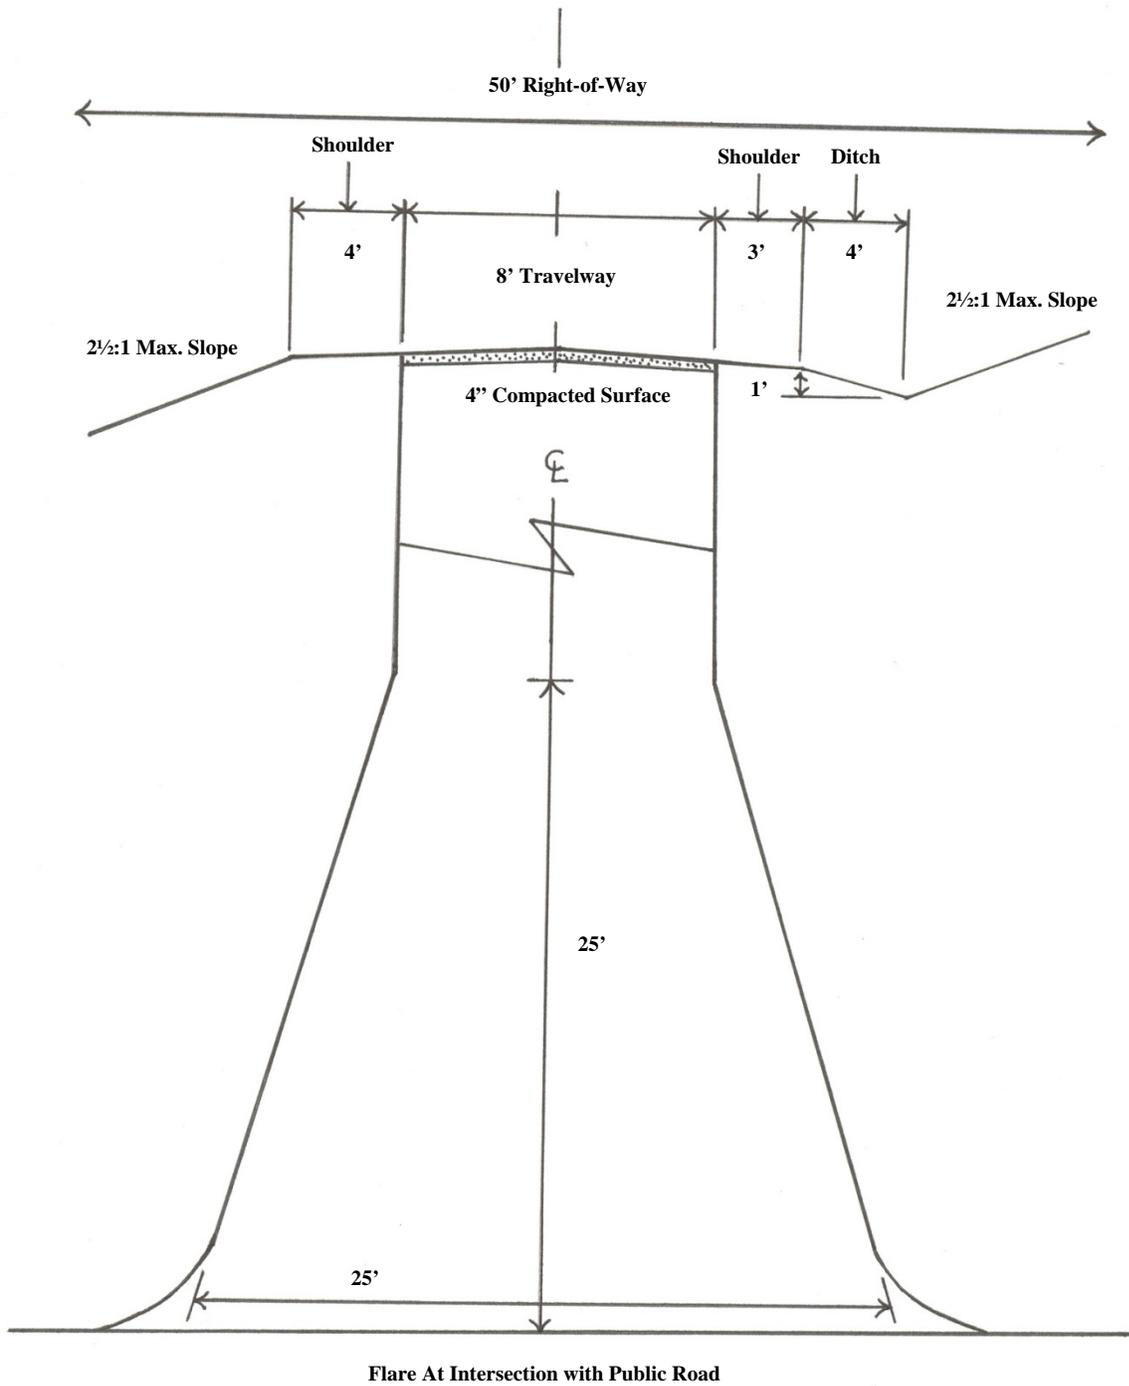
A: Class A Private Road Construction Standards Cross Section
